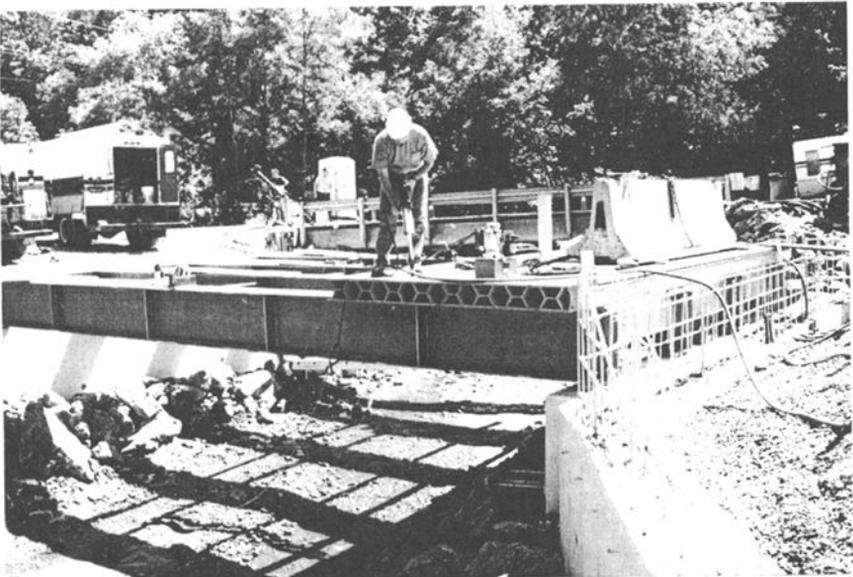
FRP Composite H-Deck (Superdeck™) - Wickwire Run Bridge
